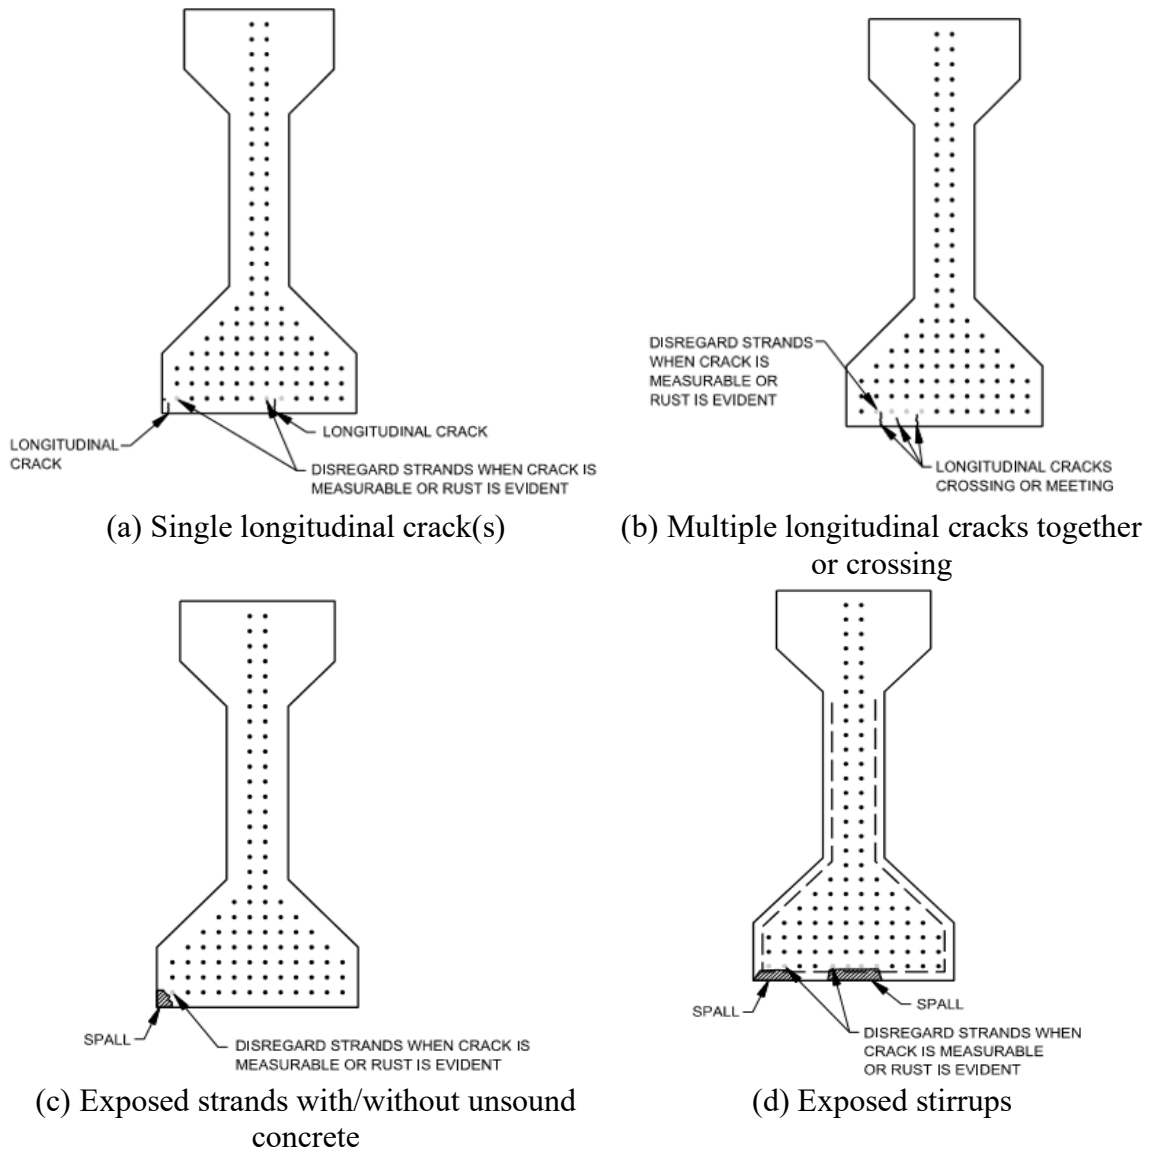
Prestressing strand disregarding procedure for PC-I girders based on the damages in the cross section (UDOT 2017)
